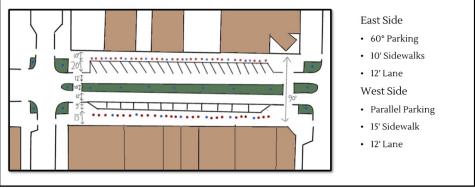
Median at 10' with wider sidewalks and parallel parking
